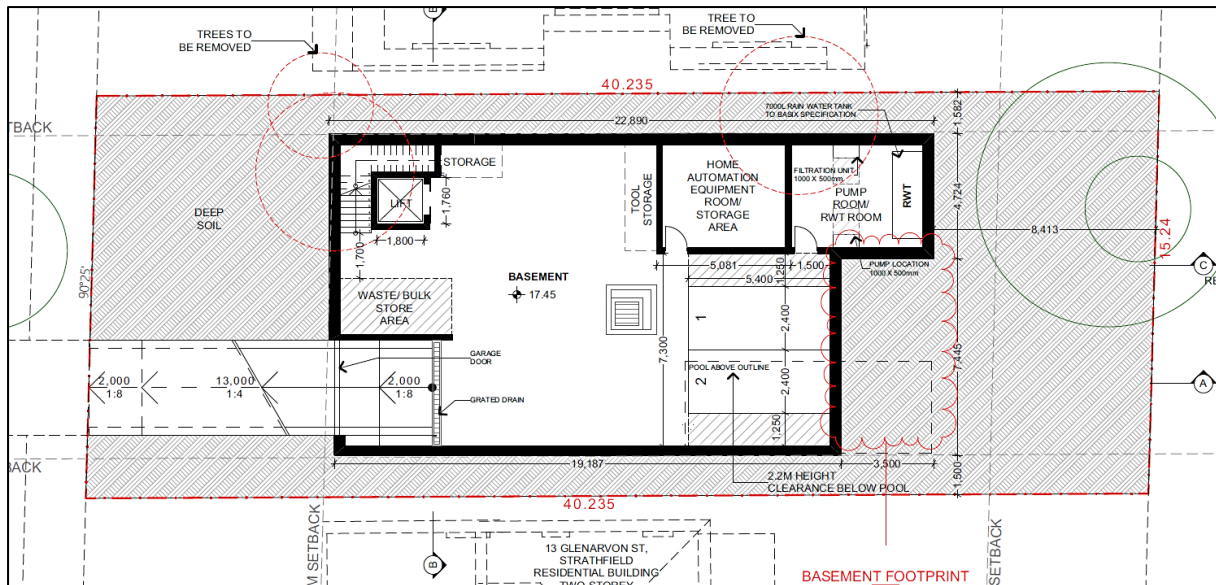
Proposed Basement Plan (Rev C, 5/09/2022)
